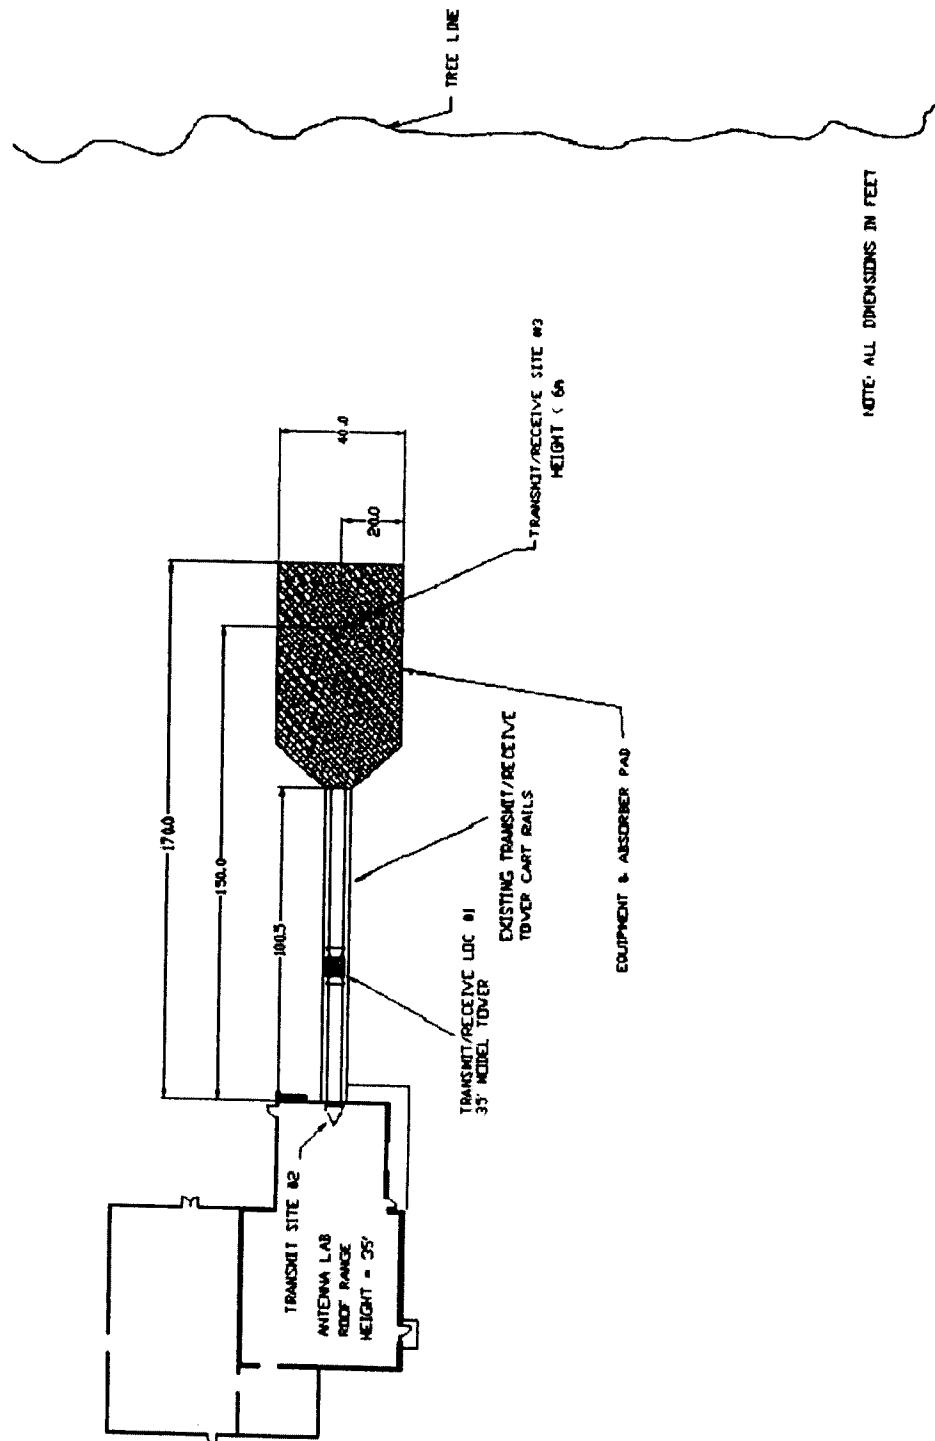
BAE Systems Lansdale, PA Outdoor Test Range Facility for proposed FCC STA
